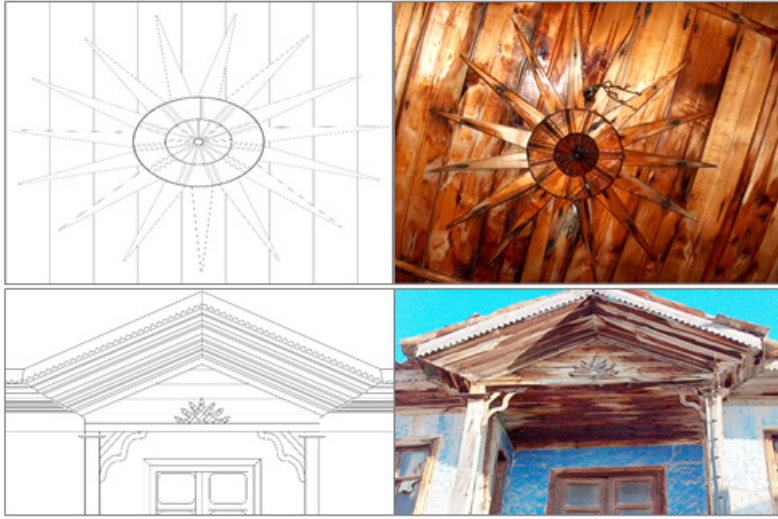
Examples of wooden ornamentation on room ceilings and gable ends above balconies
